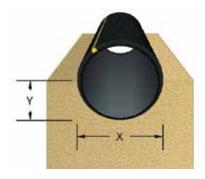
8"- 60" Diameter Pipe Rounded Trench
